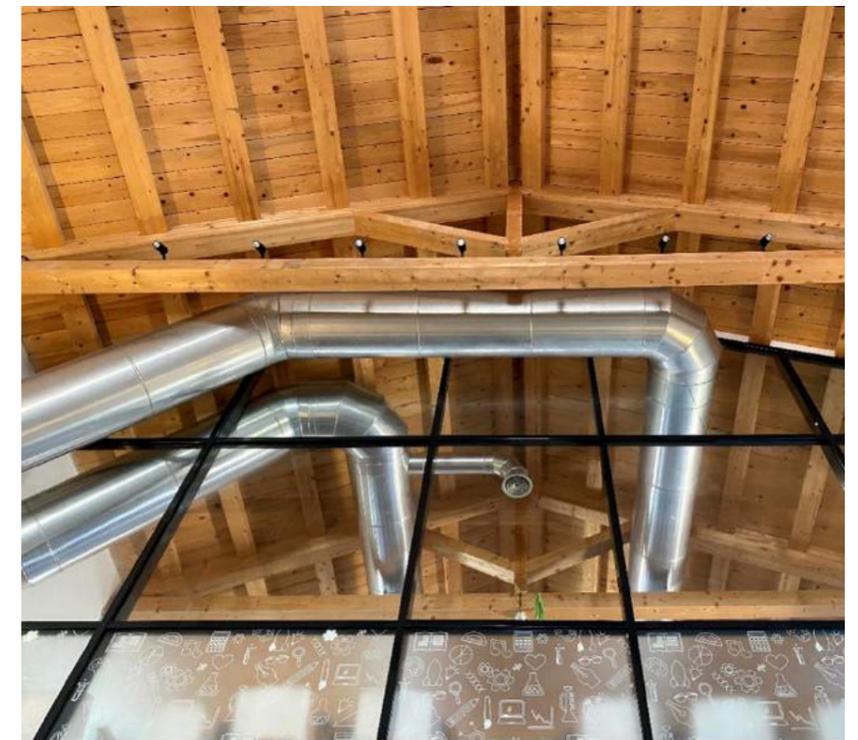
View of the roofs above of the former church restored and used as study room and detail of systems. © Eng. Luisa Lombardo
